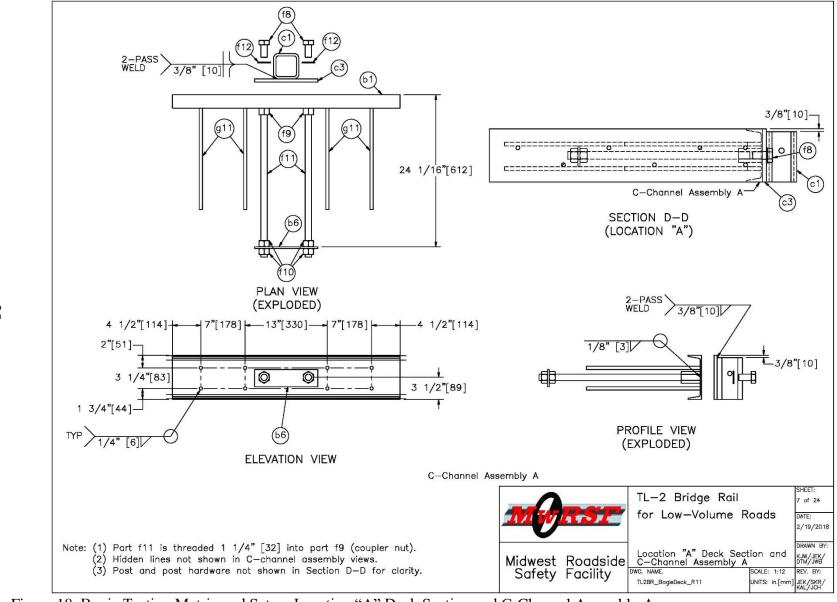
Bogie Testing Matrix and Setup, Location "A" Deck Section and C-Channel Assembly A
